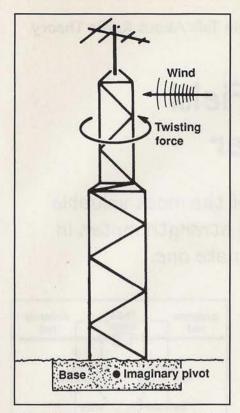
A self-supporting tower will (and should) sway in the wind. In this case, the force of the wind tries to twist the tower out of its concrete base.
